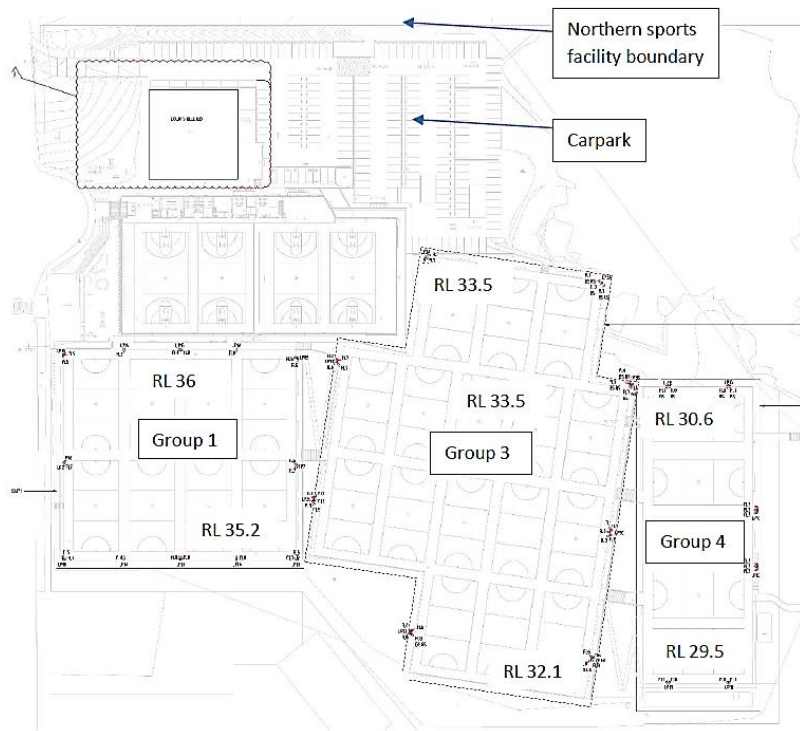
Indicative layout of lighting zones for the outdoor courts (Groups 1, 3 & 4).
